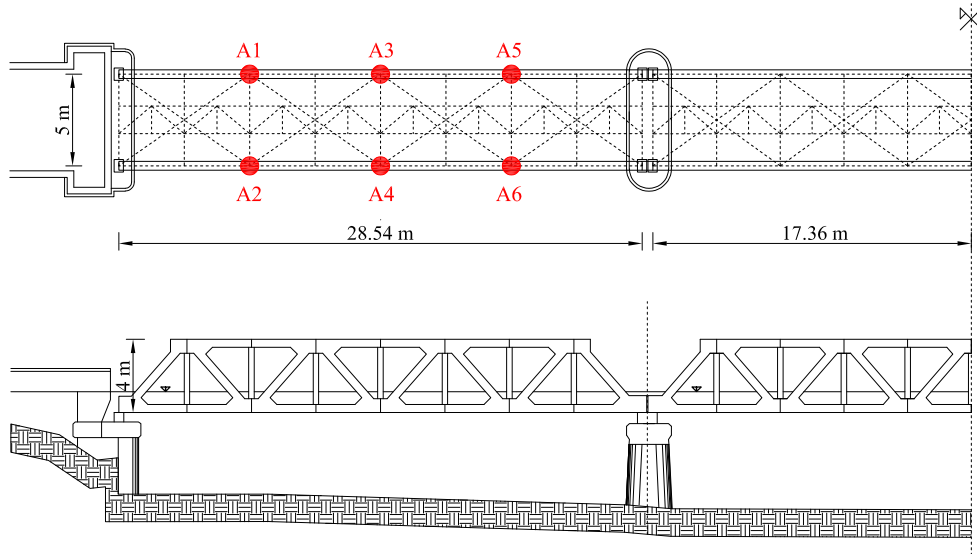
Layout of the steel railway bridge and details about the sensors position for monitoring the dynamic response of one lateral span.
